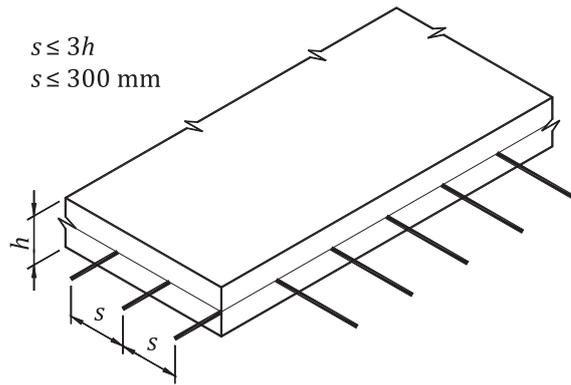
Spacing between shrinkage and temperature reinforcement in slabs
